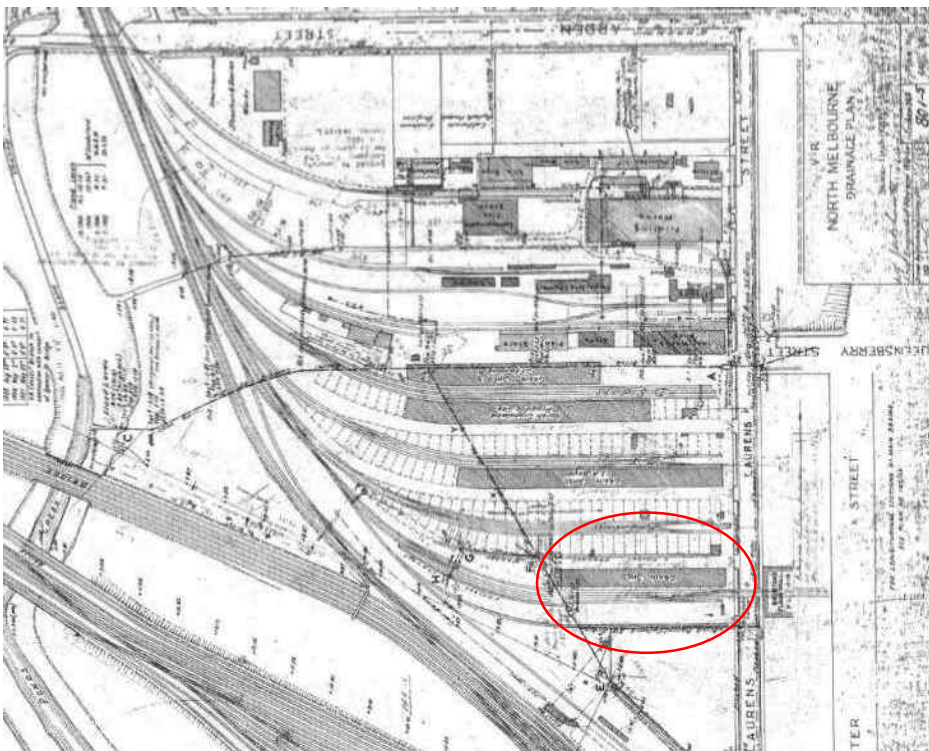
1928 plan of the Arden station precinct site, showing the development of the Railway Reserve for Railways Department workshops, and additional grain sheds/stores south of Queensberry Street (extant nineteenth century building indicated)
